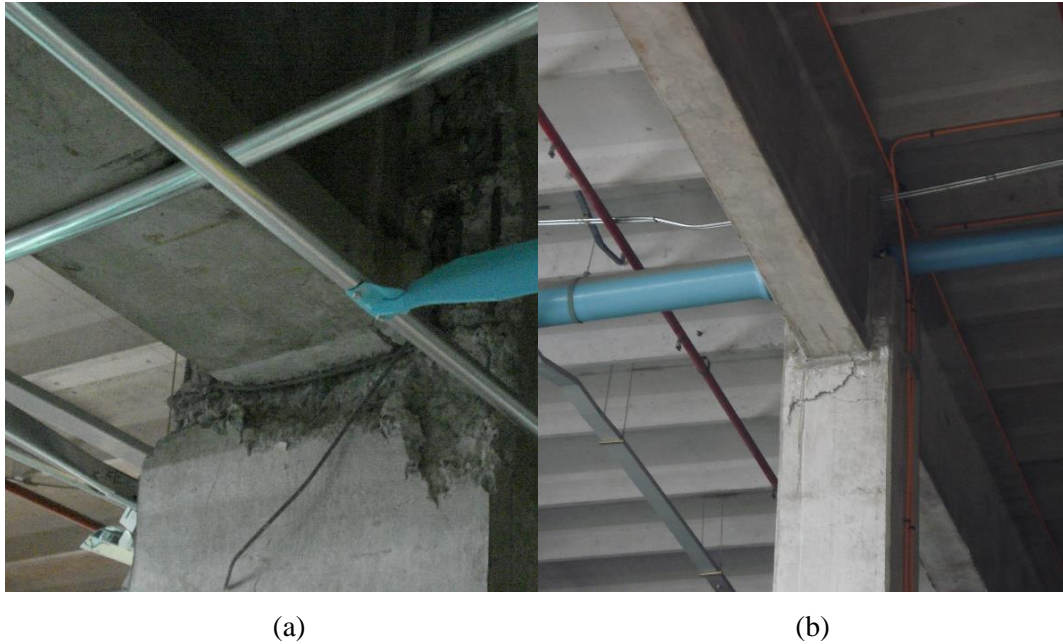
(a)-(b) Lightly damaged beam-column connection.
